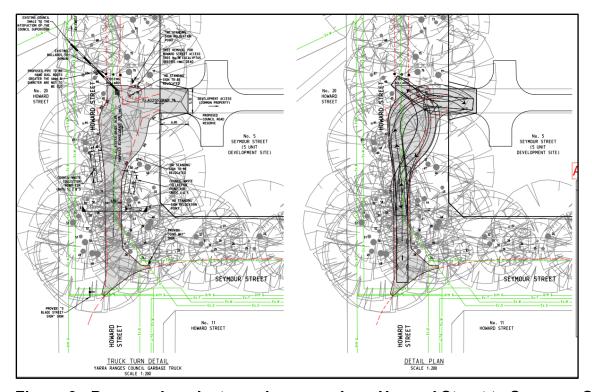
Proposed works to seal access along Howard Street to Seymour Street
